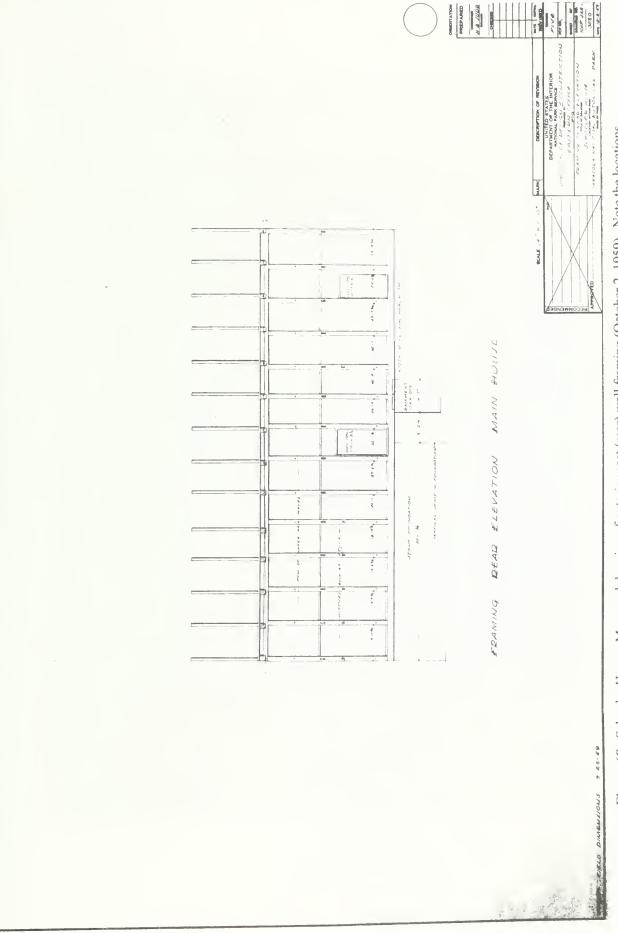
Schuyler House: Measured drawing of exterior east (rear) wall framing (October 2, 1959). Note the locations of nail holes, mortises, and "vertical joint in foundation."
